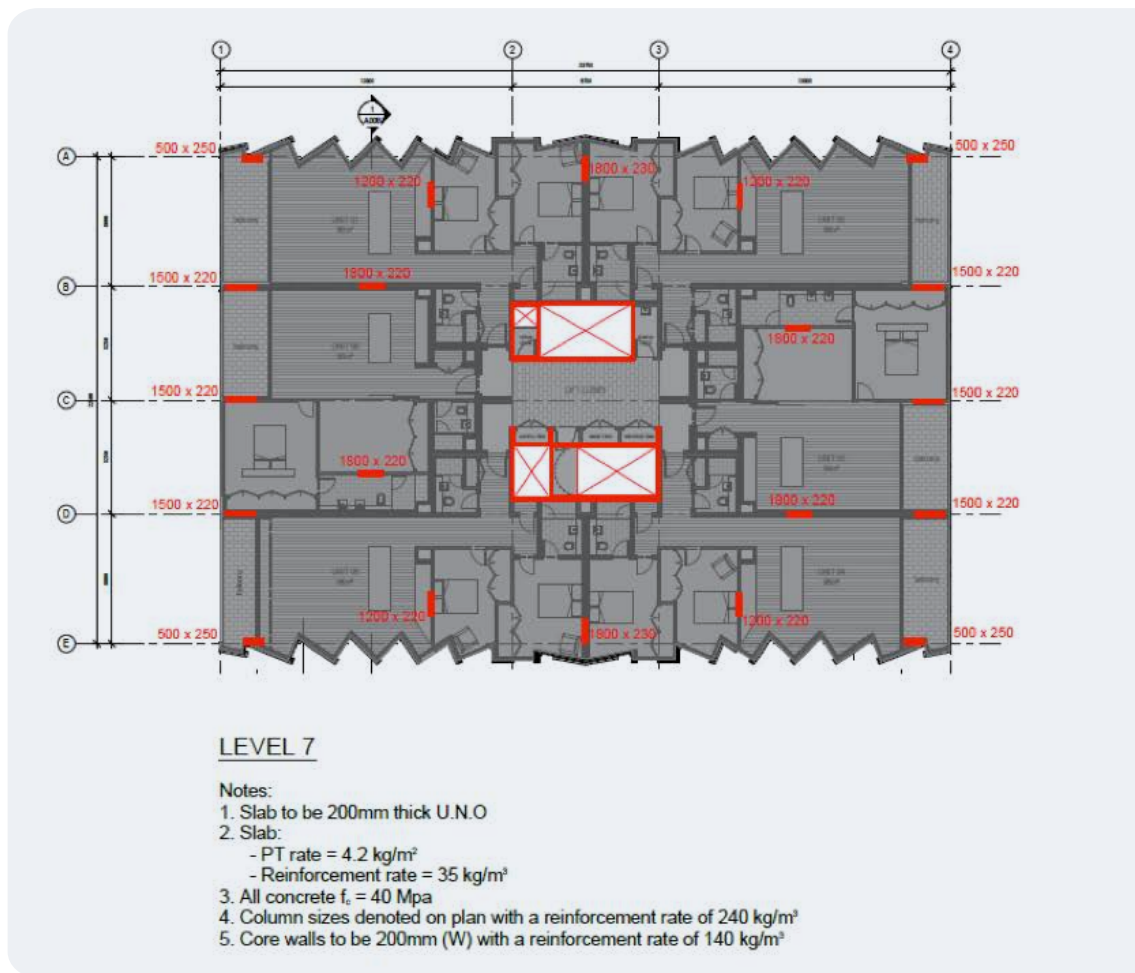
Level 2 to 7 and roof concrete slab. Design and image: TTW
